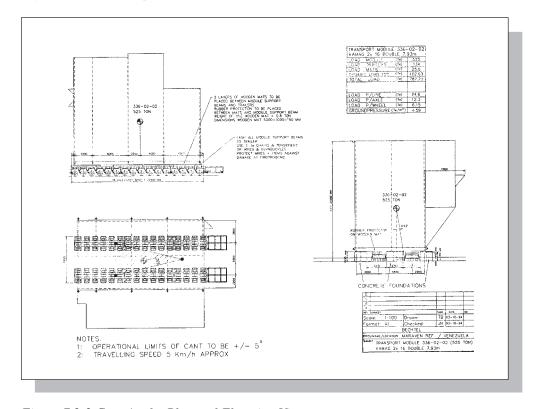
Cant Angle, Plan and Elevation Views
